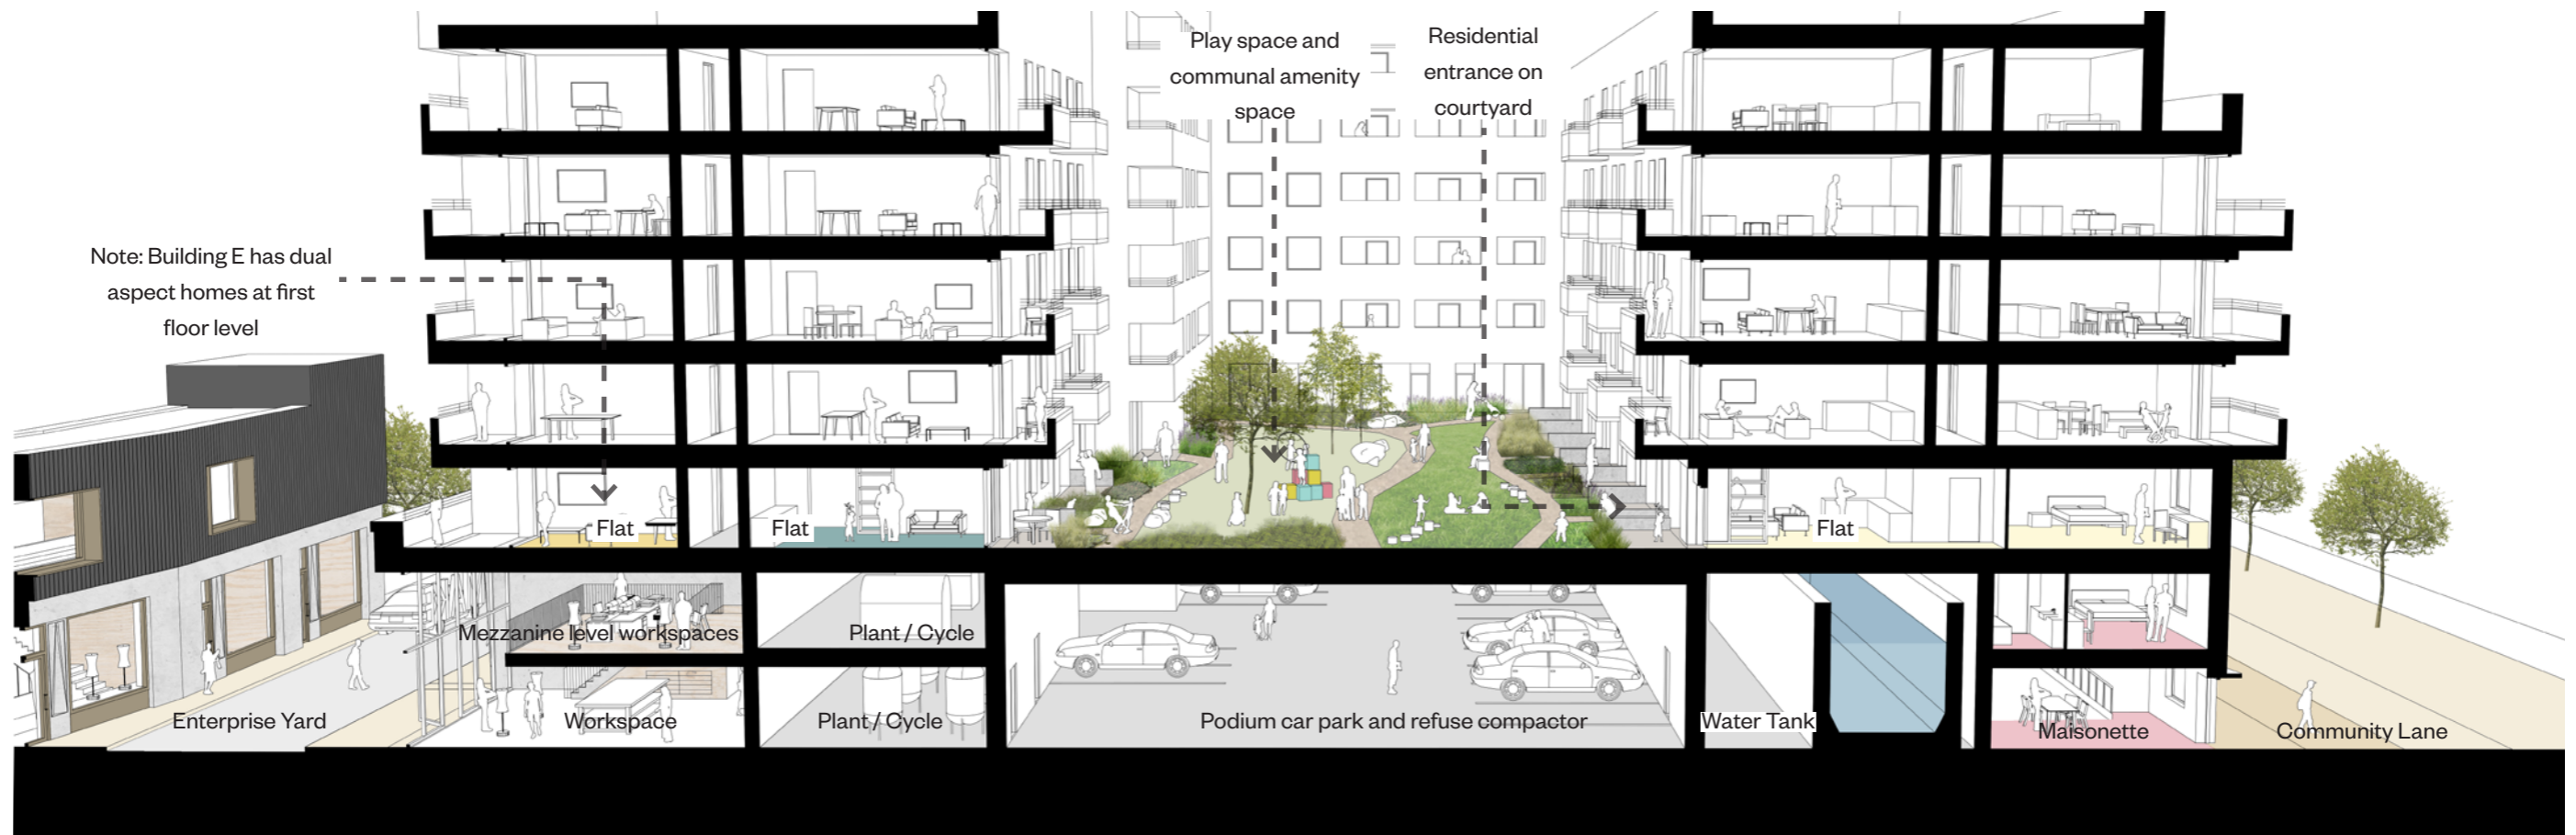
Sectional perspective of building C to illustrate building and podium organisation
